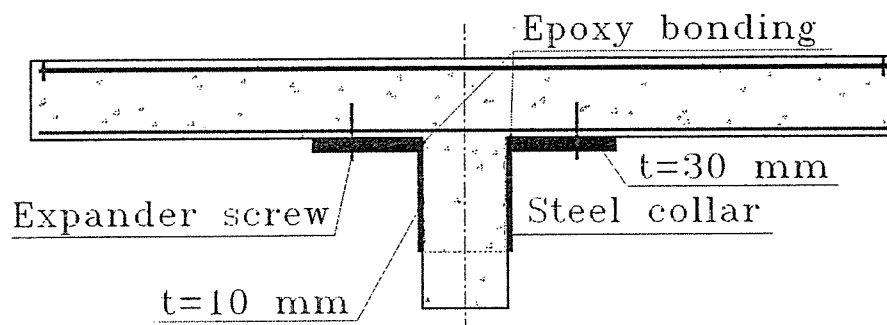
Test slab SS5.p with a new steel column head. This “steel collar” is made in two halves, which are screwed together and epoxy-bonded to the bottom side of the slab and to the column stub.
